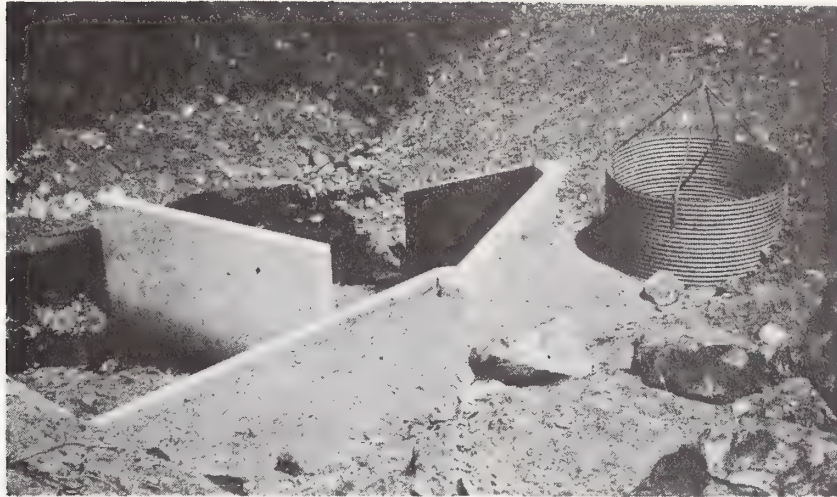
Debris fin and metal pipe debris riser in conjunction with single barrel culvert.
